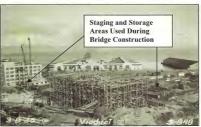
SFO Bay Bridge, Western Anchorage, view east. 300 Spear Street Project area not depicted in photo.
